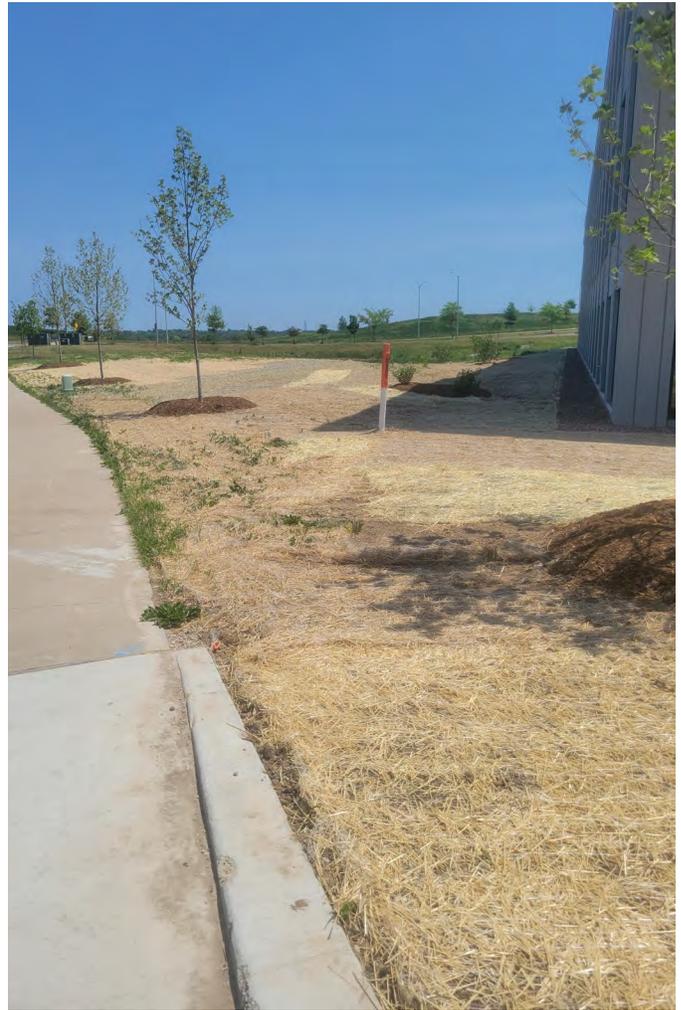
Greenspace cap along north side of Lot 3 and Building A area. Cap consists of 6-inches of topsoil with native prairie grass plantings and small trees. Limited use. View to northeast; photograph taken on June 1, 2023.
